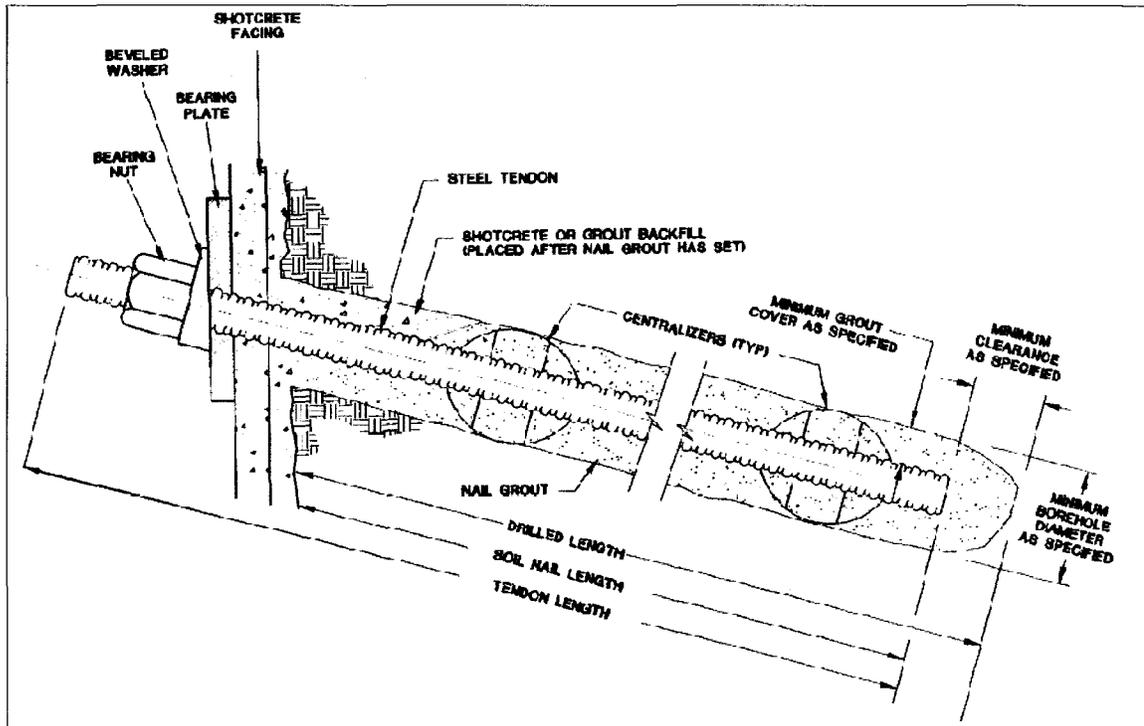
Details of a typical soil nail (Porterfield et al., 1994)
